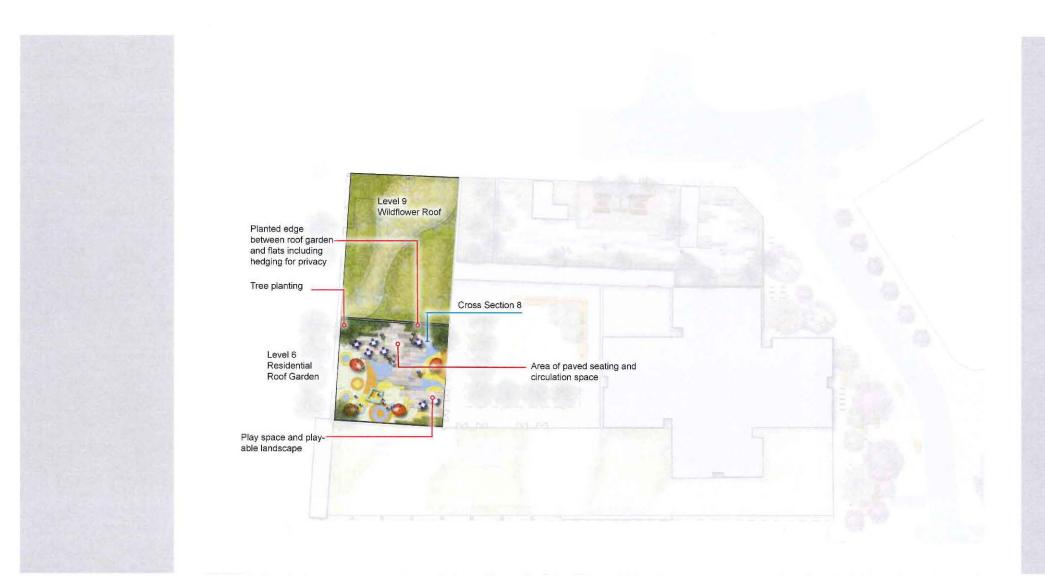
Level 6 Roof Garden Plan - Residential Accommodation and Level 9 Wildflower Roof
